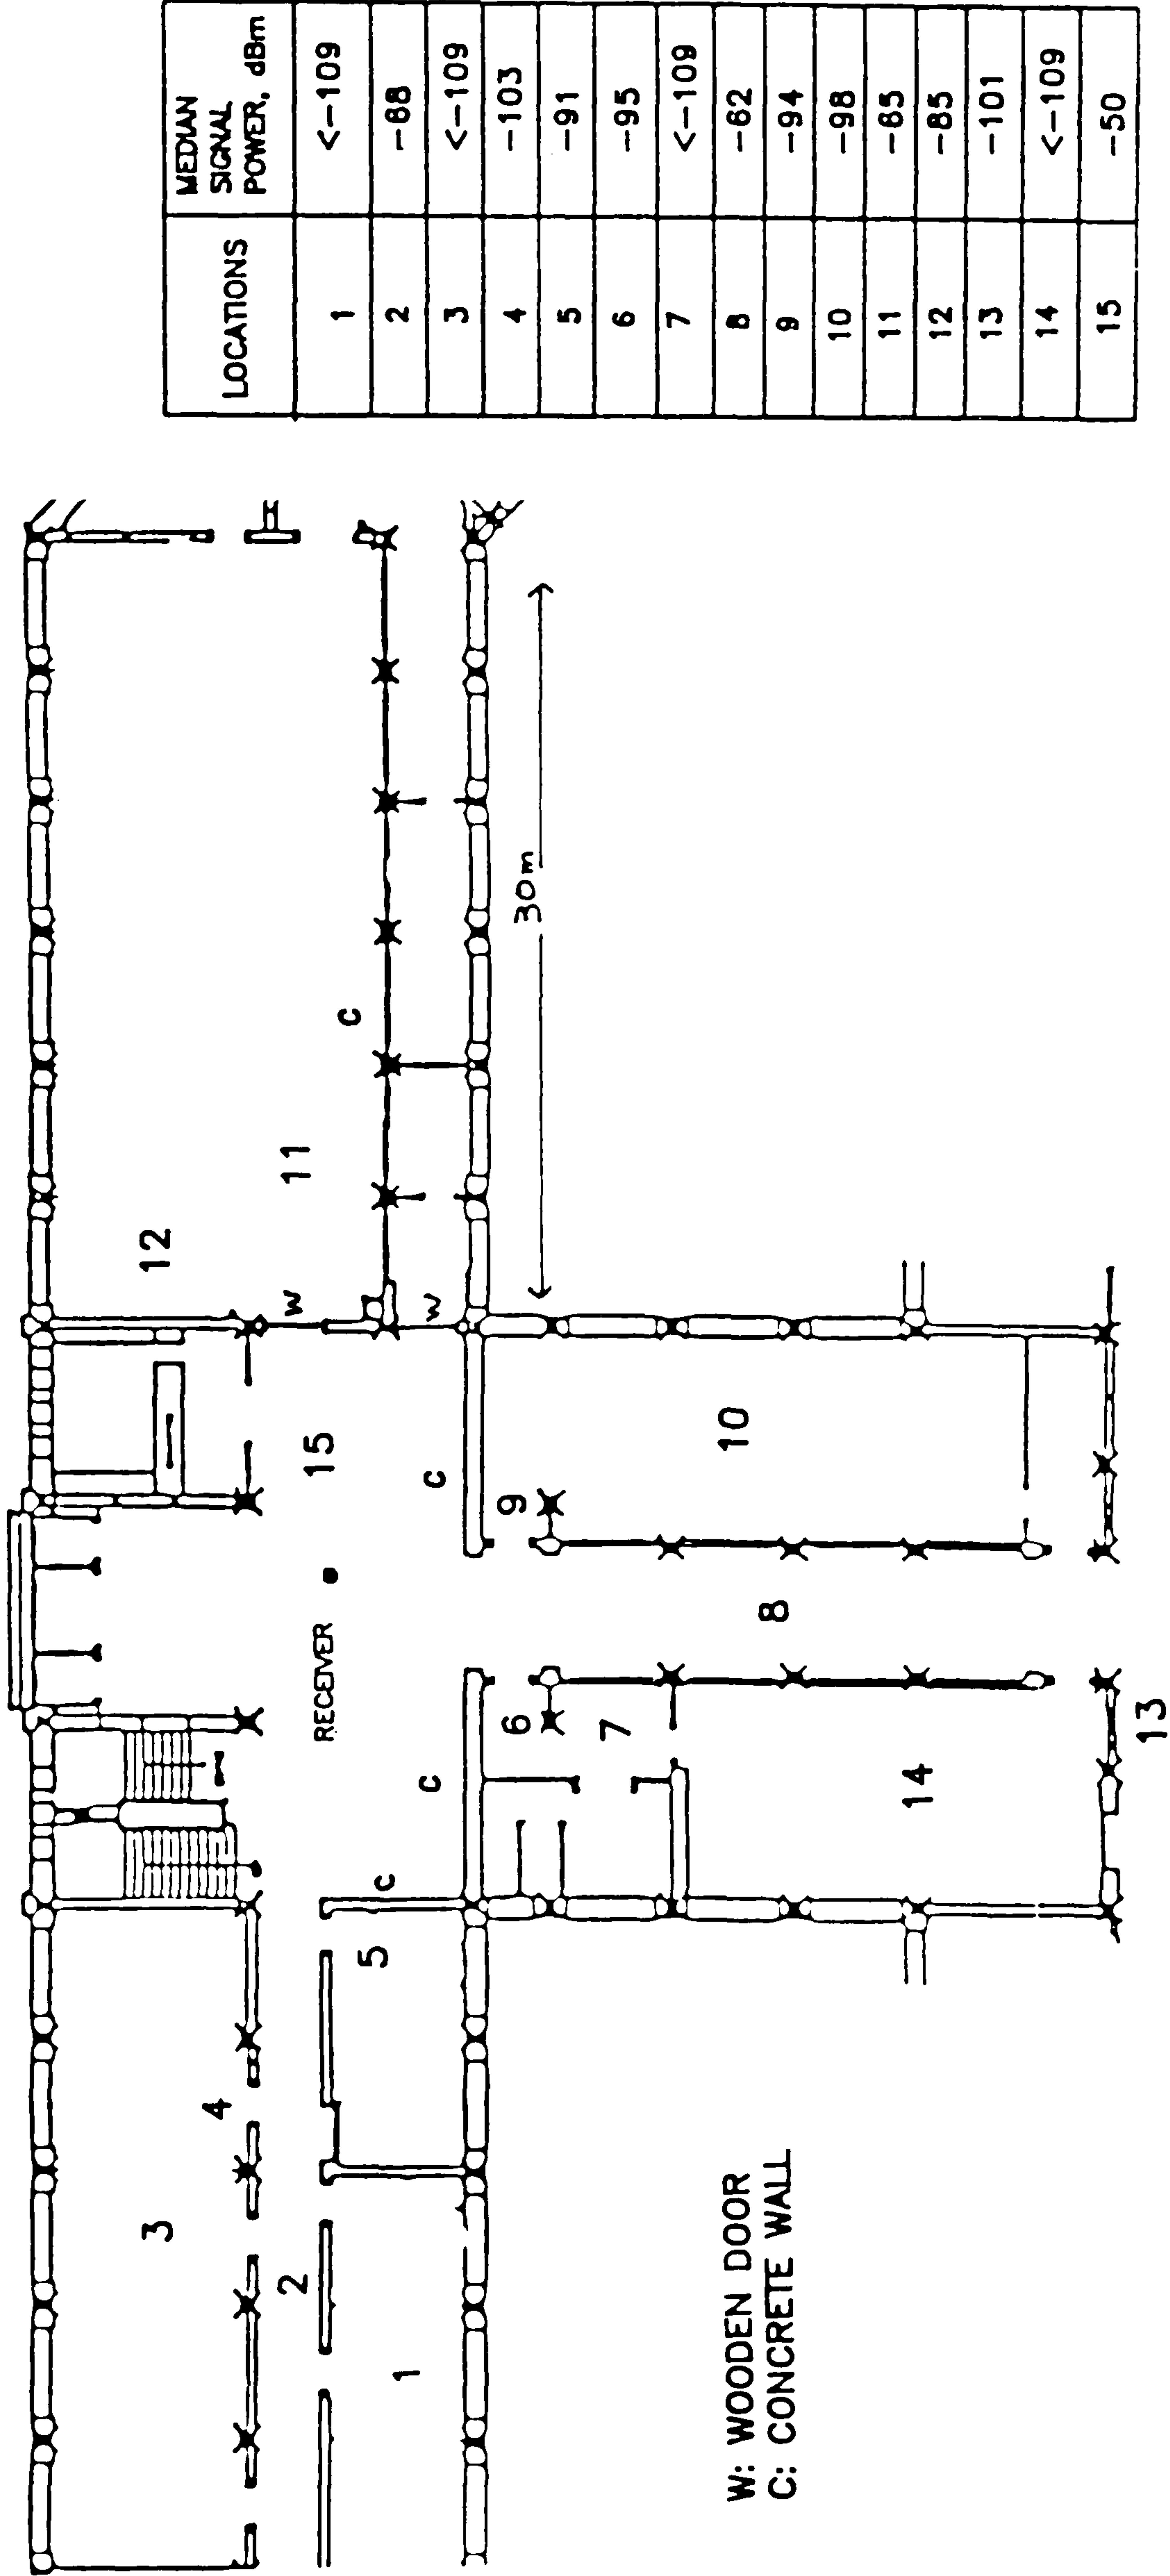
PLAN VIEW OF AN AREA WITH CORRIDORS AND ROOMS AT THE GROUND FLOOR OF THE BUILDING AND THE MEDIAN POWER AT VARIOUS LOCATIONS.
